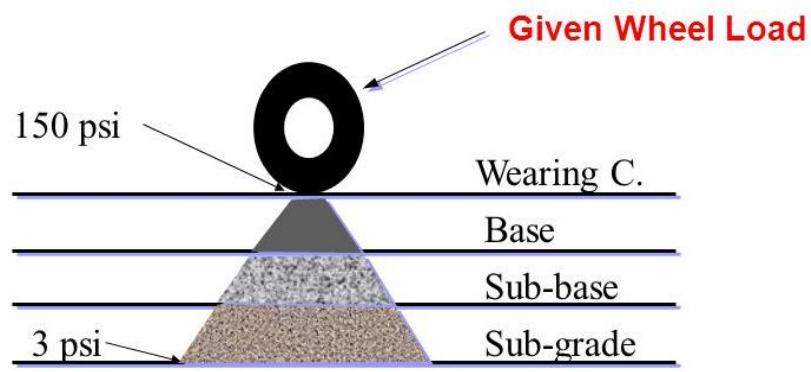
Stress Distribution in Semi-Flexible Pavement
